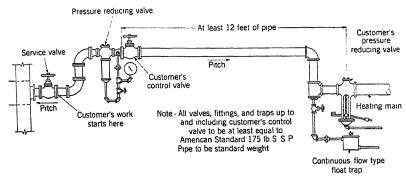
Steam Supply Connection when Using Two Reducing Valves
